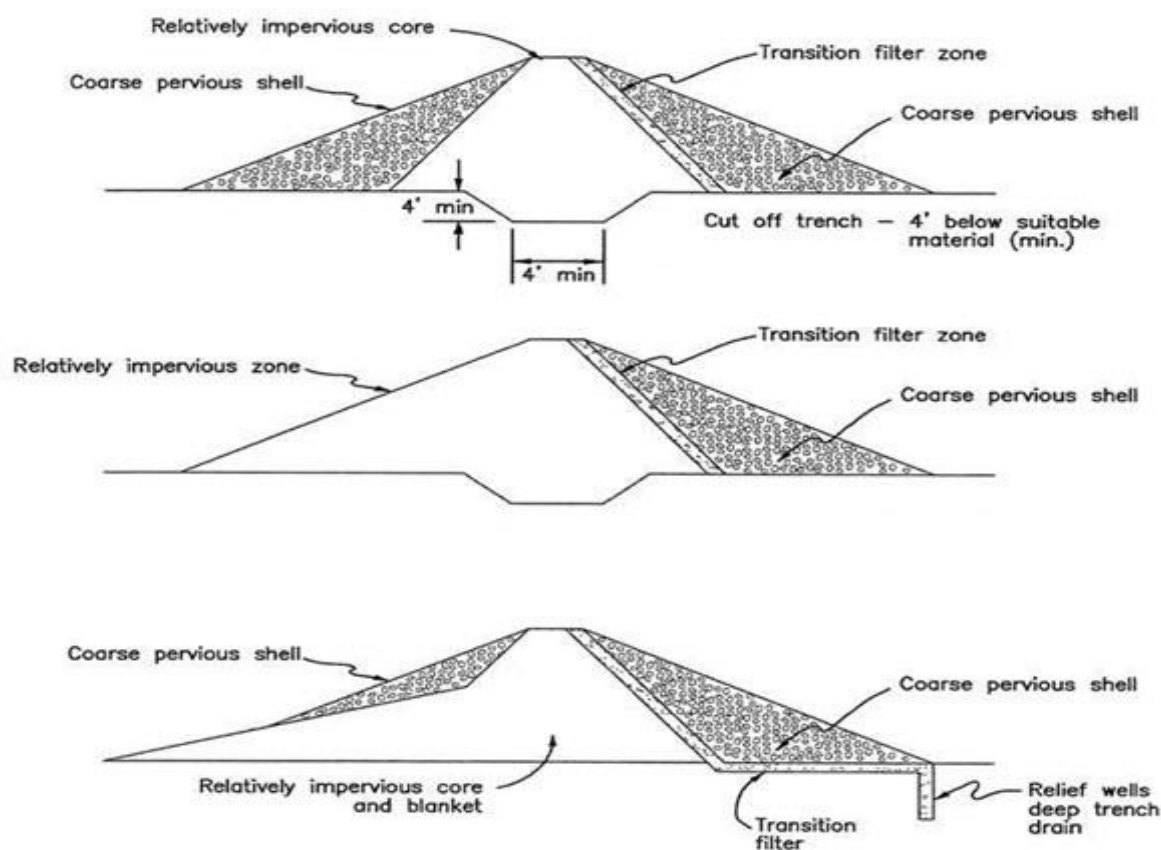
Different forms of Zoned embankments. (Source: <http://vwrrc.vt.edu>)
